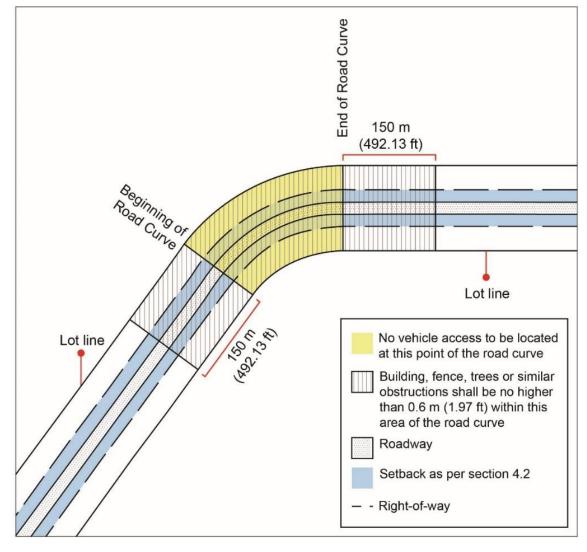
Building and Access Setbacks Requirements near Road Curves.
